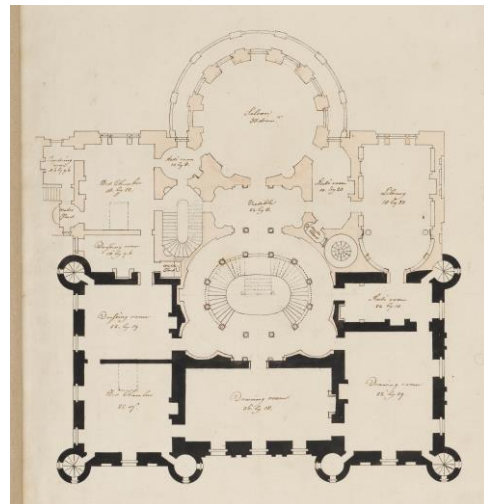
Robert Adam, "Culzean Castle Principle Floor Plan." The salon is at the top center of the image.
